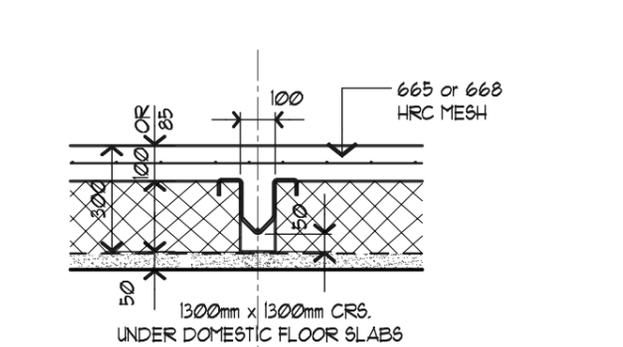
(DETAIL FOR WELL DRAINED SOILS SHOWN.
